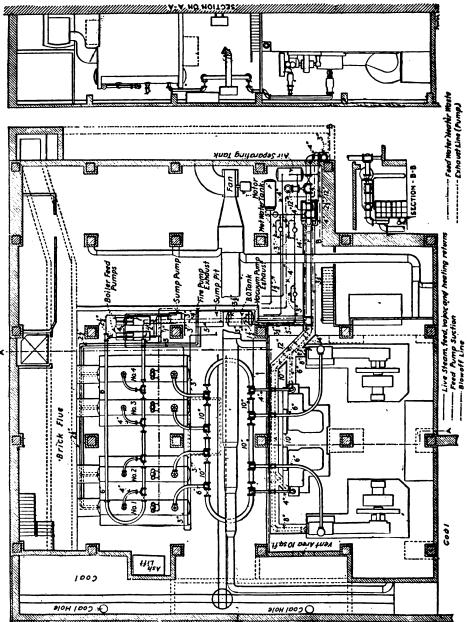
General Plan, Showing Layout of Piping for Loop Header Statem.
